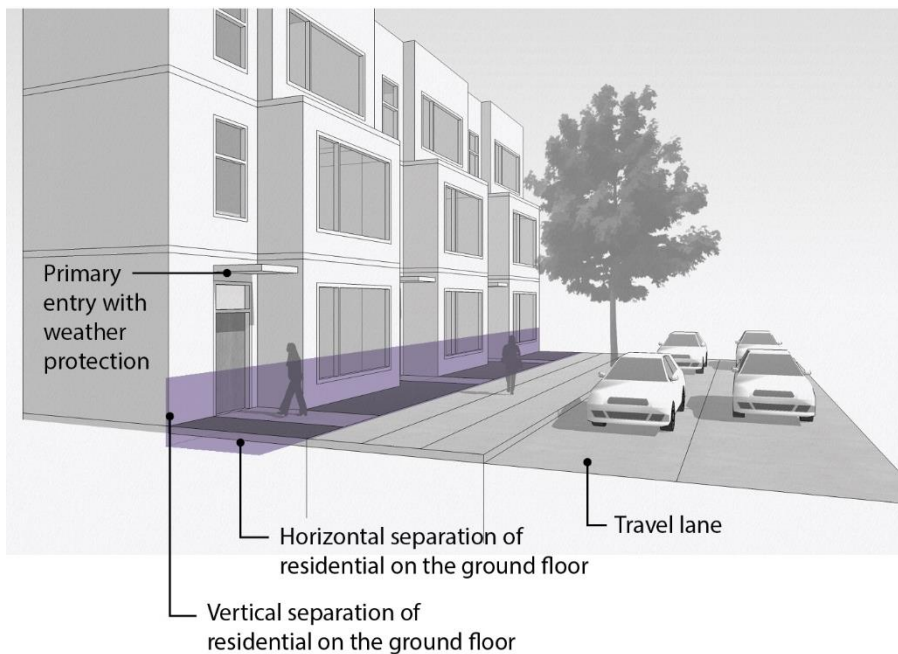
shows required vertical or horizontal separation when residential uses are on the ground floor in the proposed MU-2 zone on State Street.
